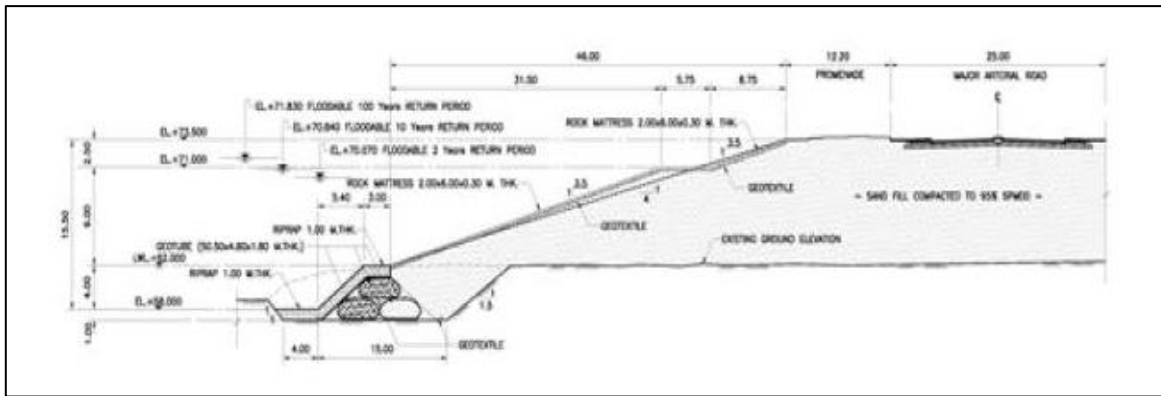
Section of Waterfront (rip rap geotube + rock mattress) Alternative 8
